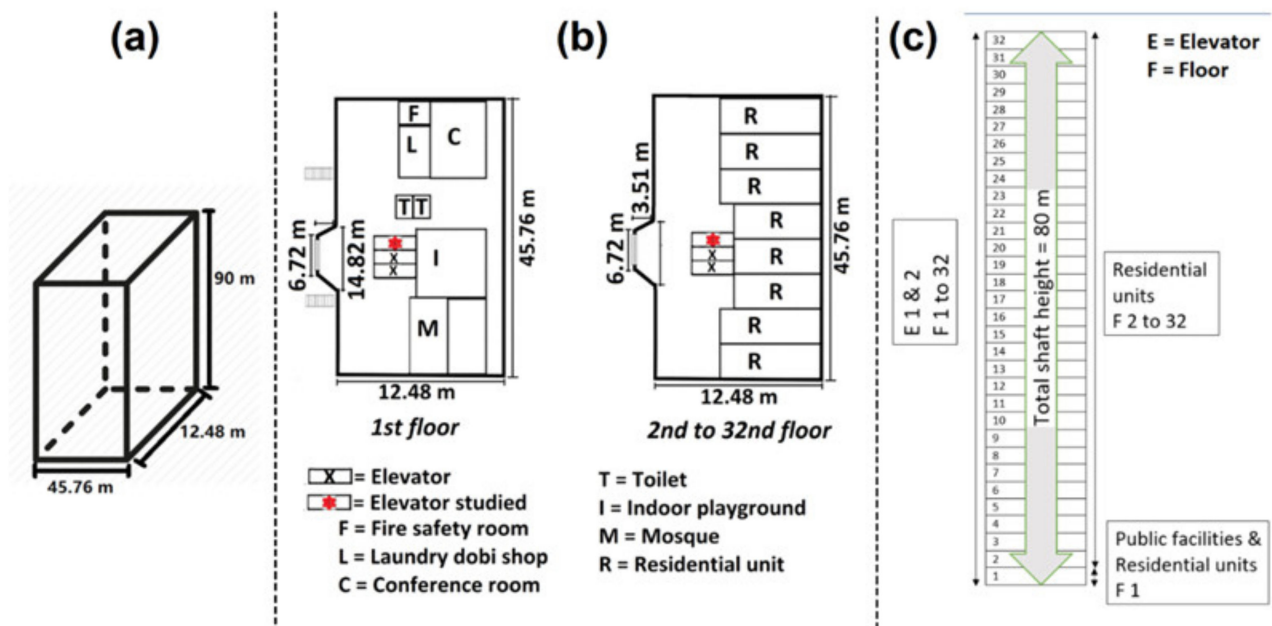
HA (a) building dimensions, (b) building floor plan, and (c) function and operating lift of different floors.
